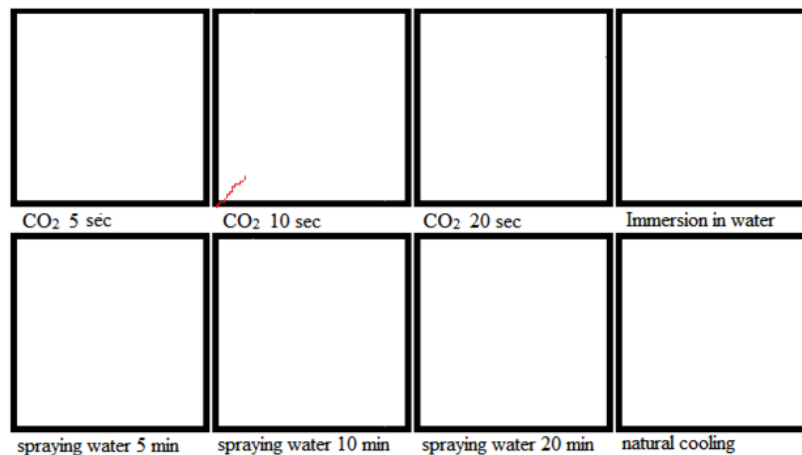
(b). Retouched images of cracks developed at the surface of recycled glass concrete specimens at 200 °C.
